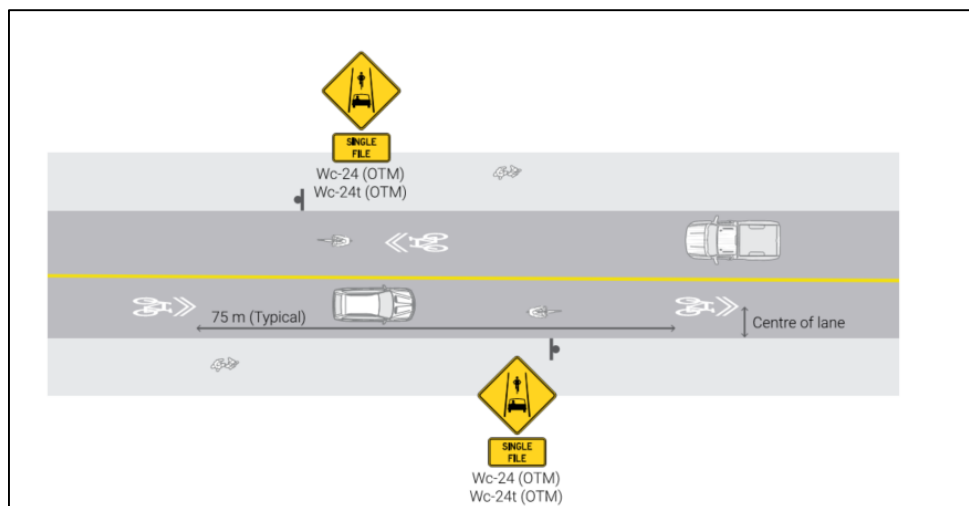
Typical Use of Sharrows (single, narrow lane)
